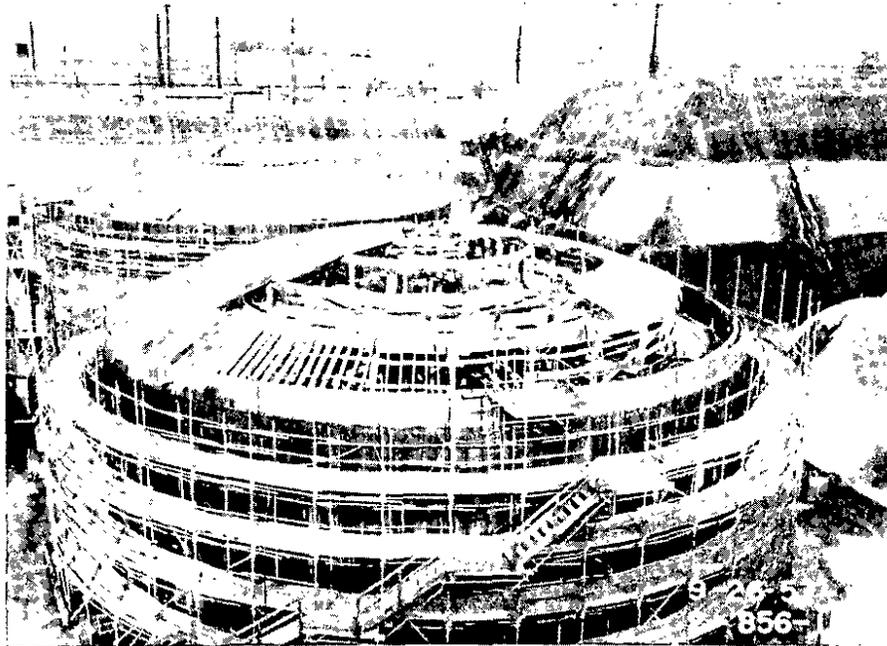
EXHIBIT VIII-A VIEW SHOWING WALL SCAFFOLD AND DOME FORM SUPPORTS
